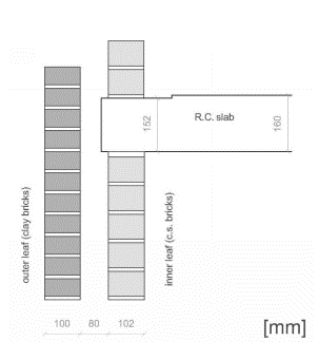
Detail of the connection between the r.c. slab of the first and the inner leaf (c.s. walls) - South side.
